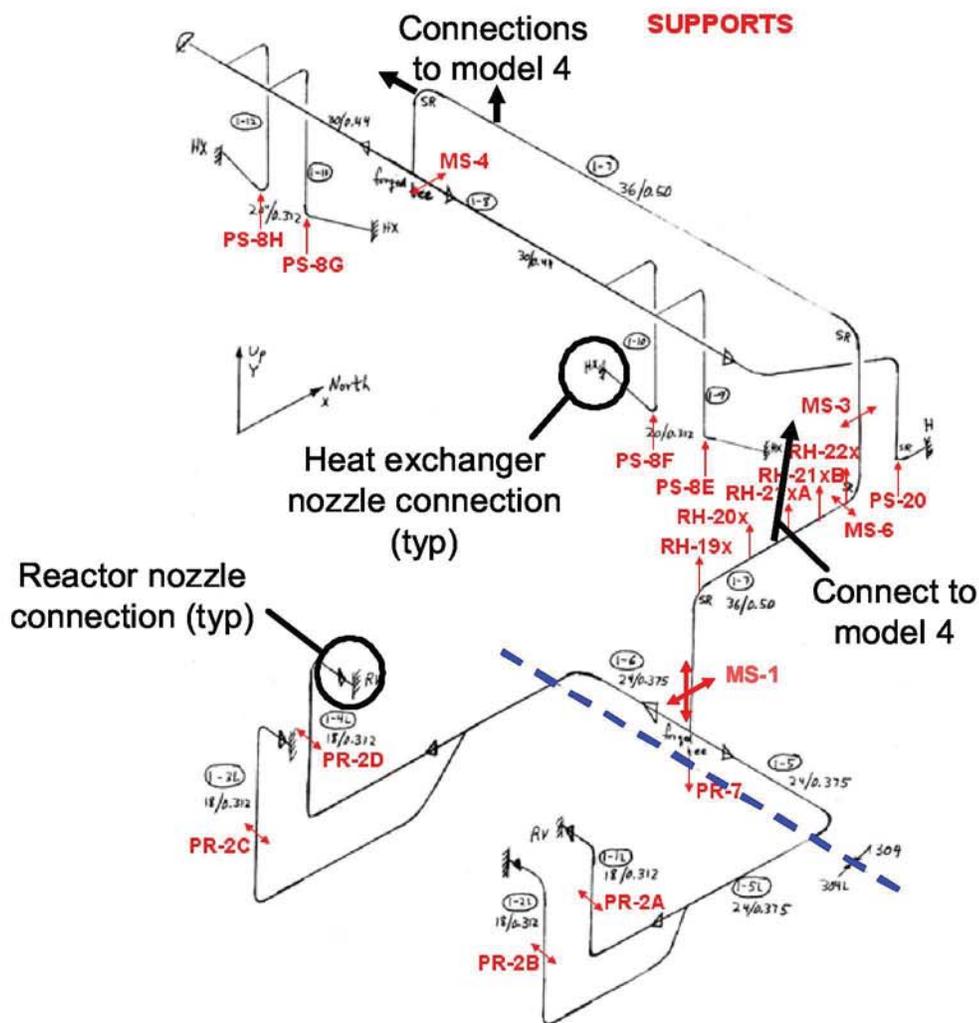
Piping section of Model 14, showing original 1 beam model and connections.
